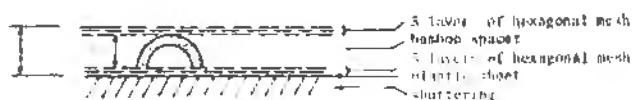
Split bamboo rods as spacers to ensure greater lever arm.
